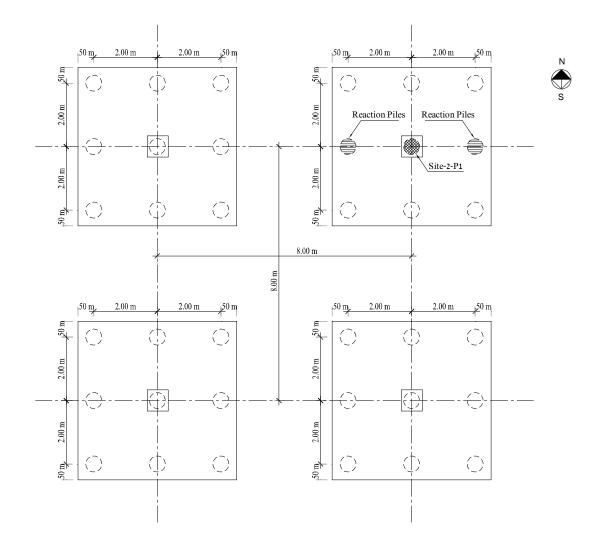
Location of test piles on pile layout at Manikganj site (S-02)
